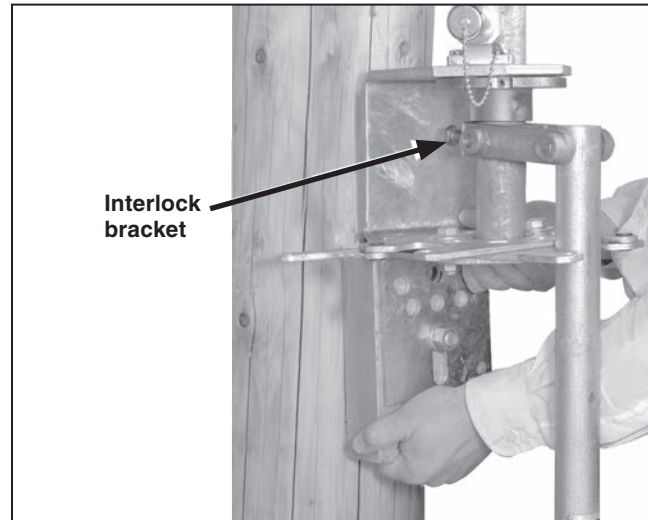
Position the interlock bracket, locking disc, operating handle assembly, and foot-bearing assembly onto the lowest vertical operating-pipe section.
